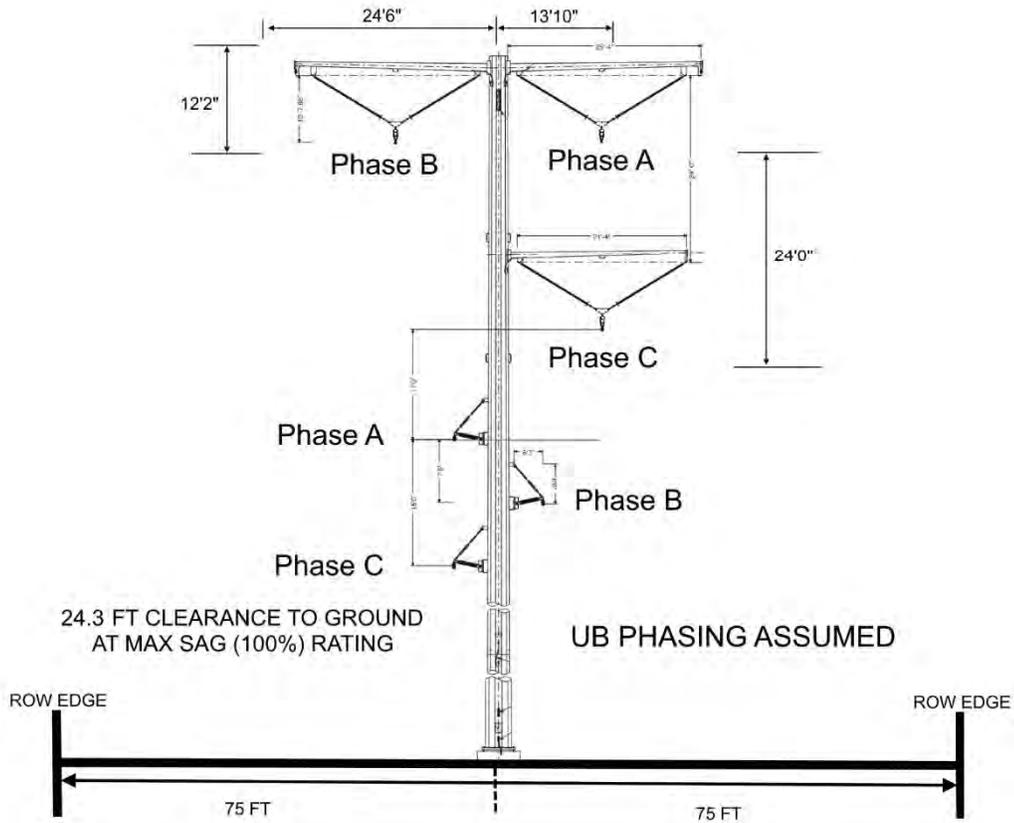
Wilmarth – West Faribault Circuit with 69 kV Underbuild
